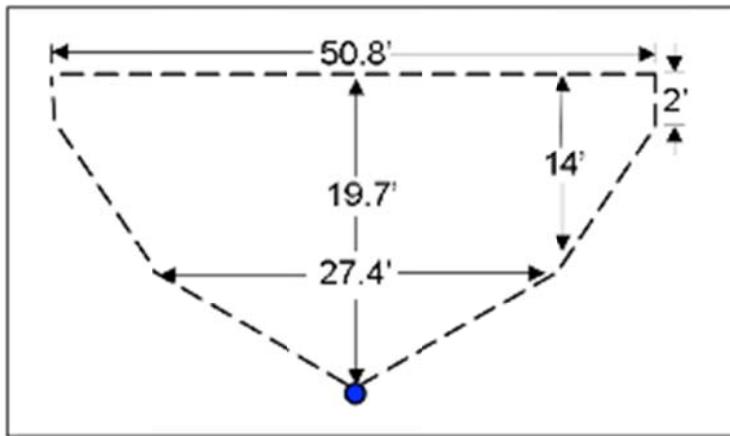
Dimensions of Hamerschlag Hall green roof water monitoring area.
